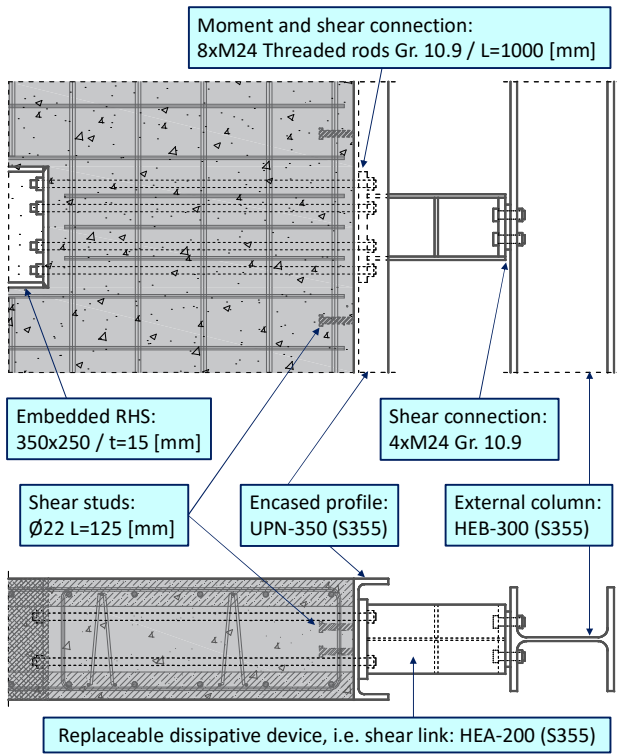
Technical solution for the HCW Configuration 2 "HCW_C-2", and detail of the connection zone between shear link and: • composite wall; • external steel column.
